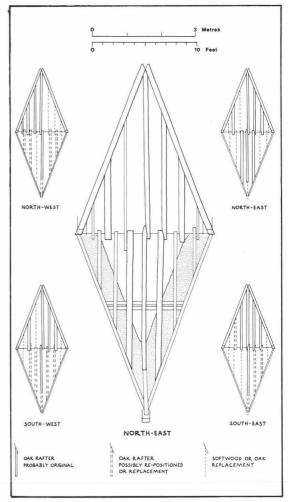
Elevations of the roof slopes showing rafters and hips, drawn parallel to slope. Centre, the north-east slope as existing. The four smaller diagrams show the extent of survival of original rafters in the four roof slopes.
